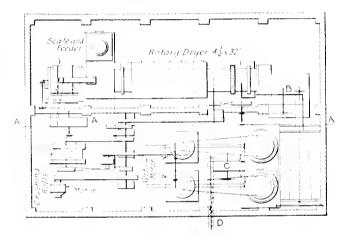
40-FT. BY 60-FT. COAL MILL, MACHINERY PLAN
